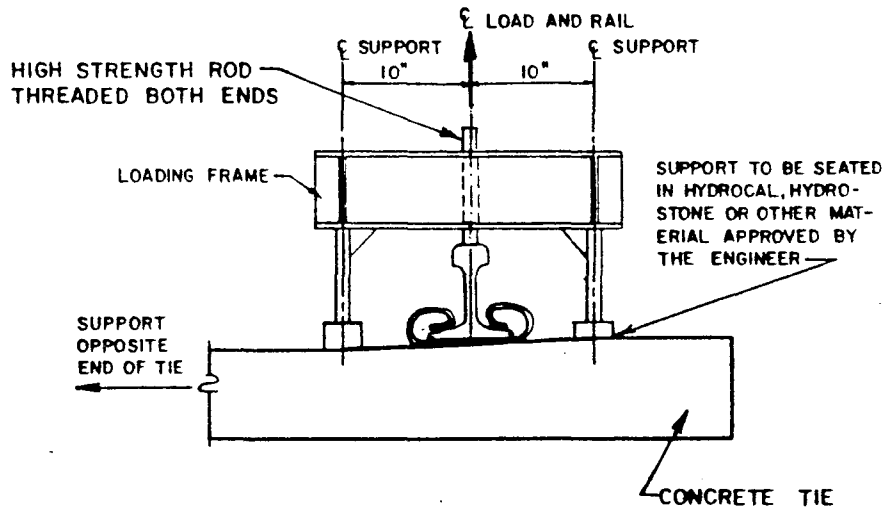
RAIL FASTENING UPLIFT TEST
